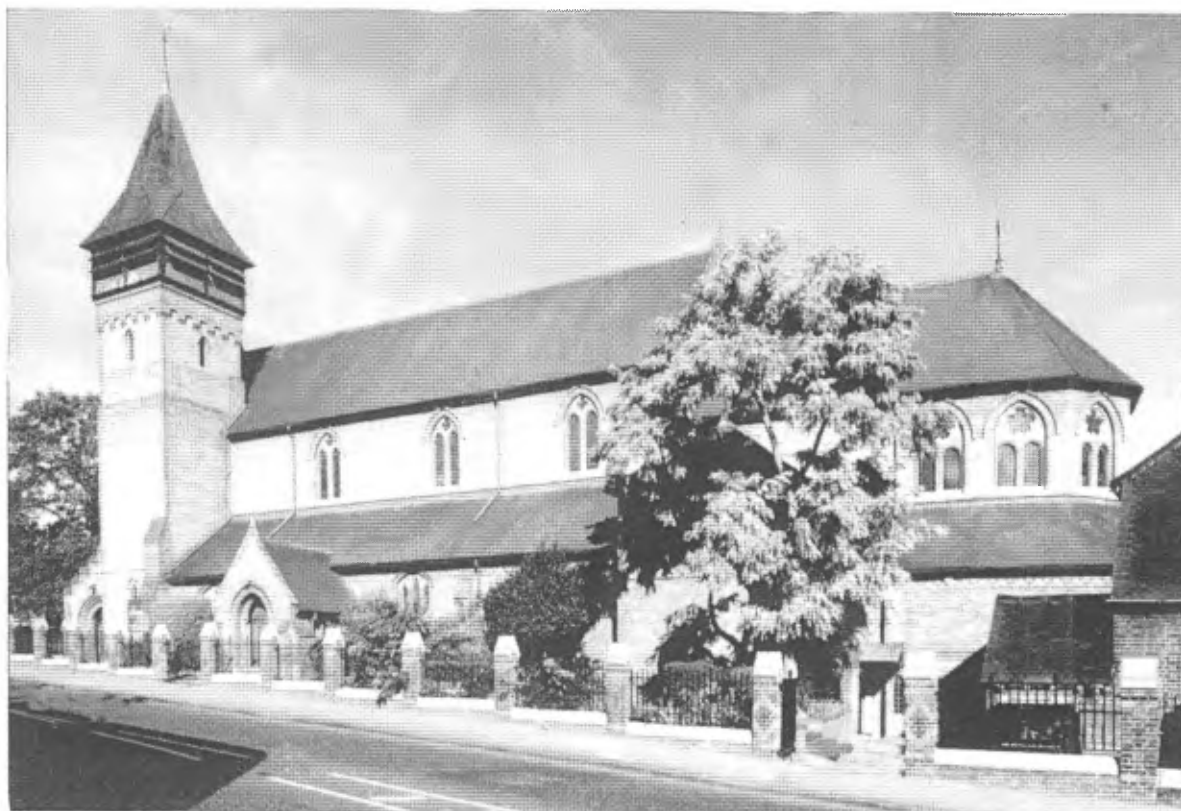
St Mark's church, Battersea Rise, Battersea, by William White, was built in 1872-74 with brick facing to concrete walls, in an Early English style with lancet windows. The shingled timber spire is an addition.
